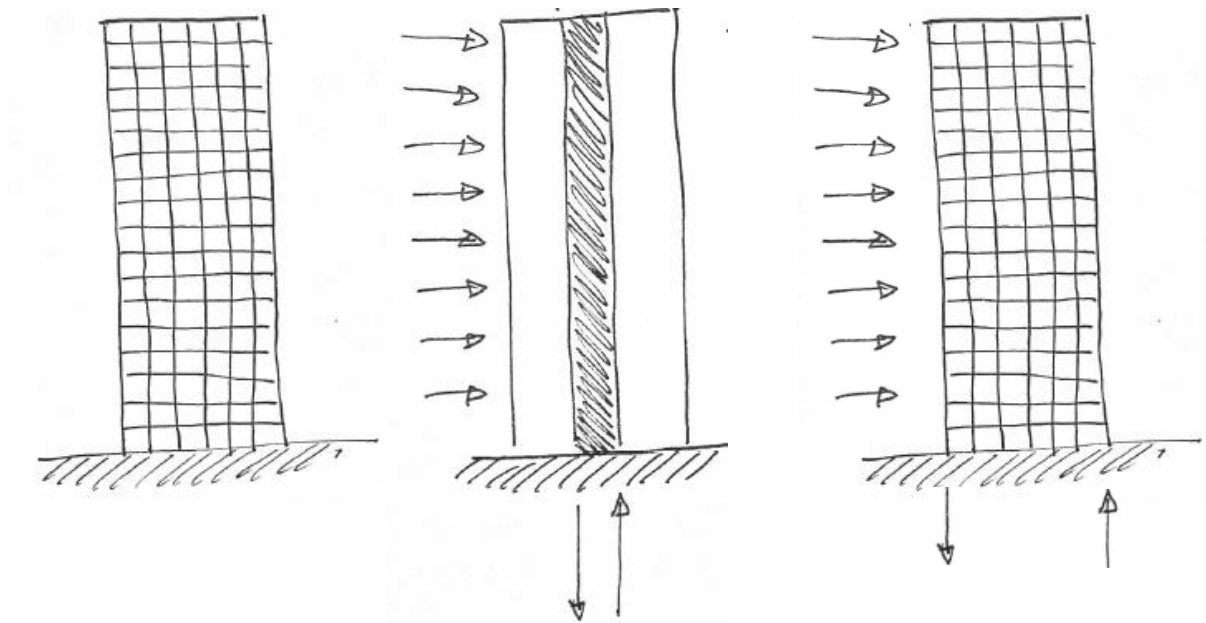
Left: Facade tube structure with columns closely spaced in the façade Middle: A core system has a relatively short cantilever arm for stabilising against lateral loads, leading to large stresses in the core Right: A façade tube structure has a longer cantilever arm, which decreases stresses.
